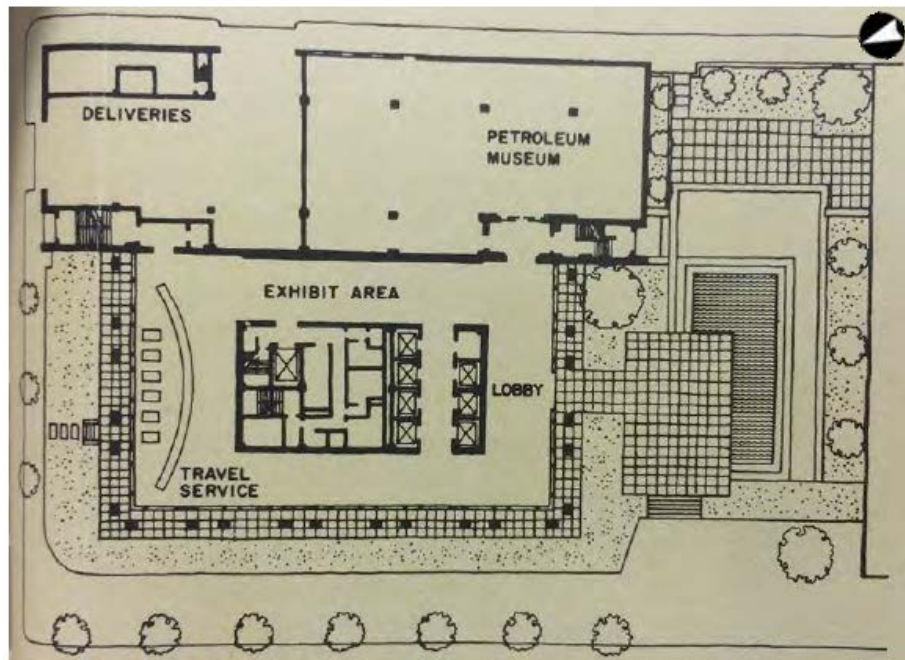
First floor plan and plaza of 555 Market Street. Source: "Early Consultation Works for Unity of Arts" *Architectural Record* vol. 141, issue 7 (June 1967) 180-181.⁷¹
